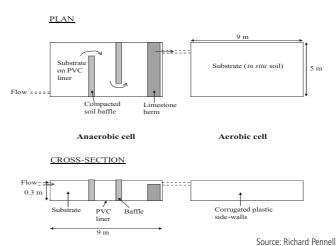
Layout of Gavinswelly pilot-scale constructed wetland in plan and cross-section.
